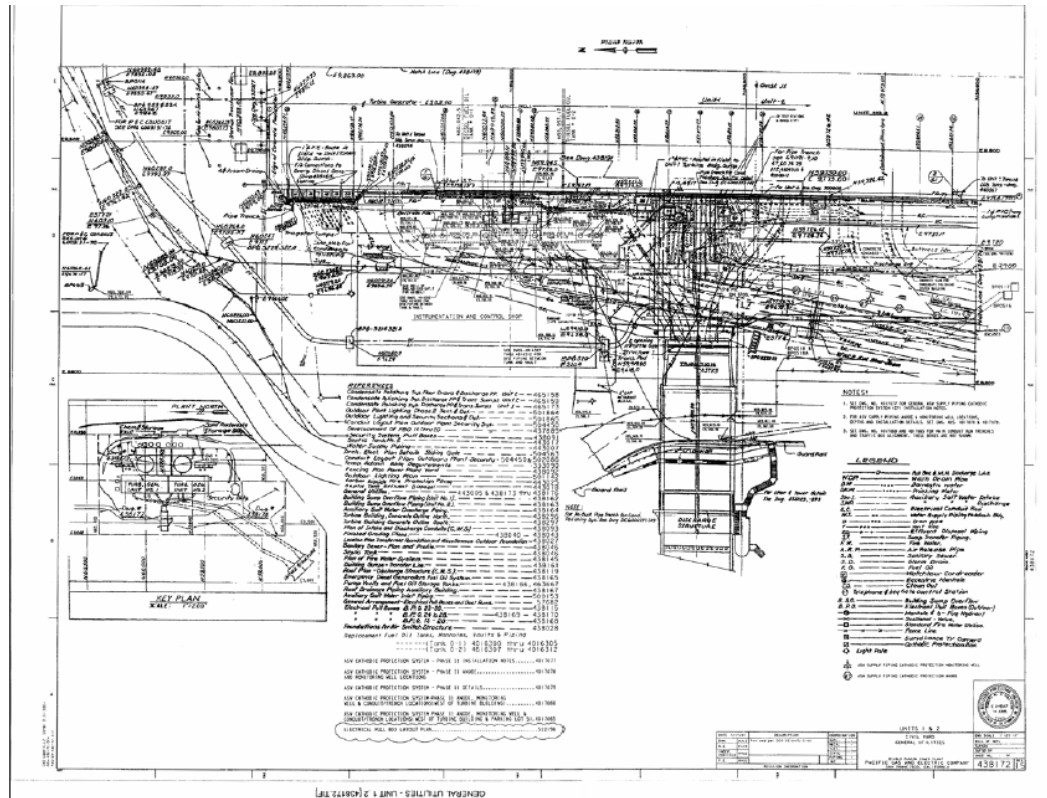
Plan View of Tie-in Underground Construction Conditions in Front of Turbine Building
